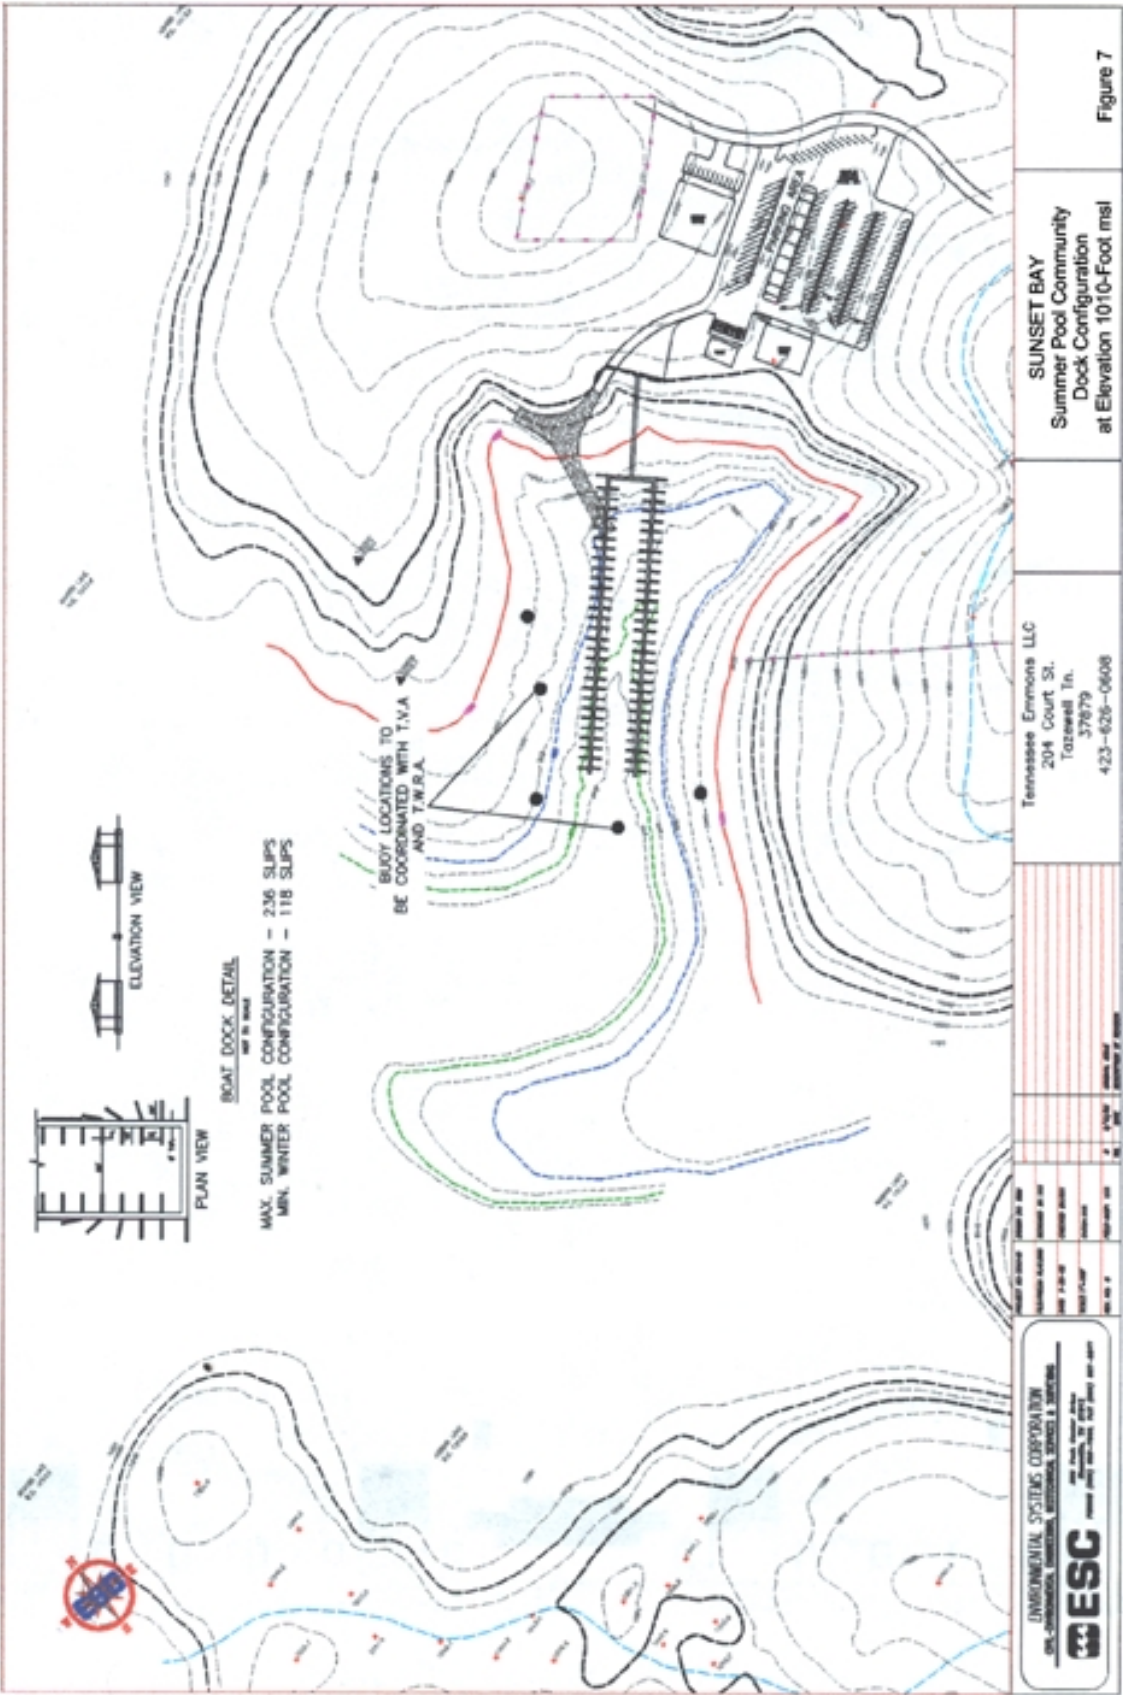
Sunset Bay Summer Pool Community Dock Configuration at Elevation 1010-Foot msl
